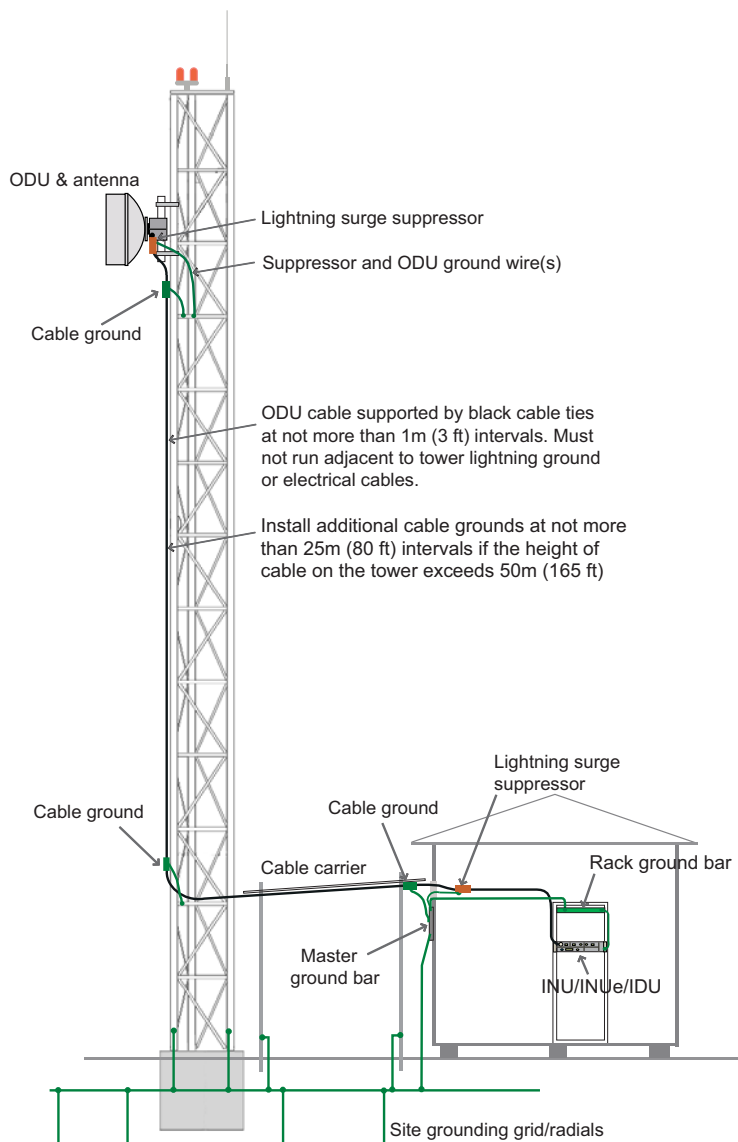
on page 2-19 shows typical tower locations for cable grounding and lightning surge suppressors. Note that an external suppressor is shown at the ODU end.
